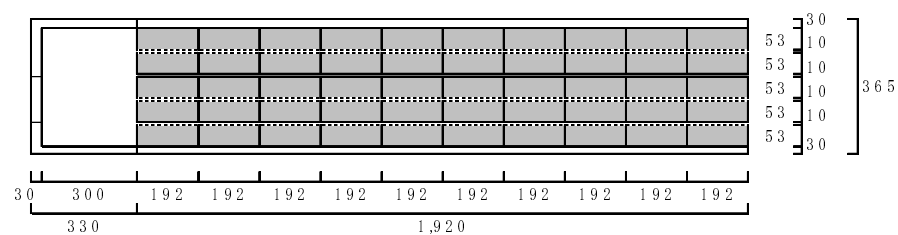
Vertical cross section of thermal storage equipment. (unit; mm)
